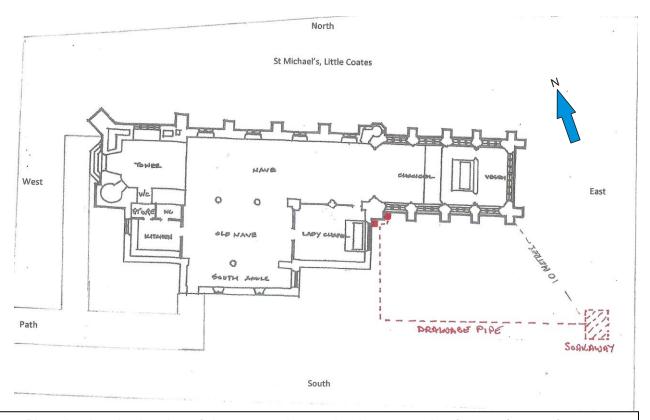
Plan showing the location of the proposed groundworks at a scale of 1:200 (extract from a plan submitted with the faculty)
